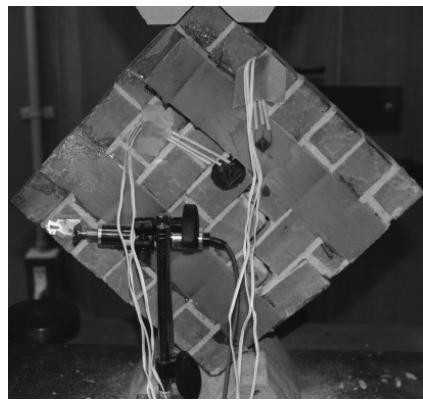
Failure Pattern of GFRP retrofitted masonry wallet
